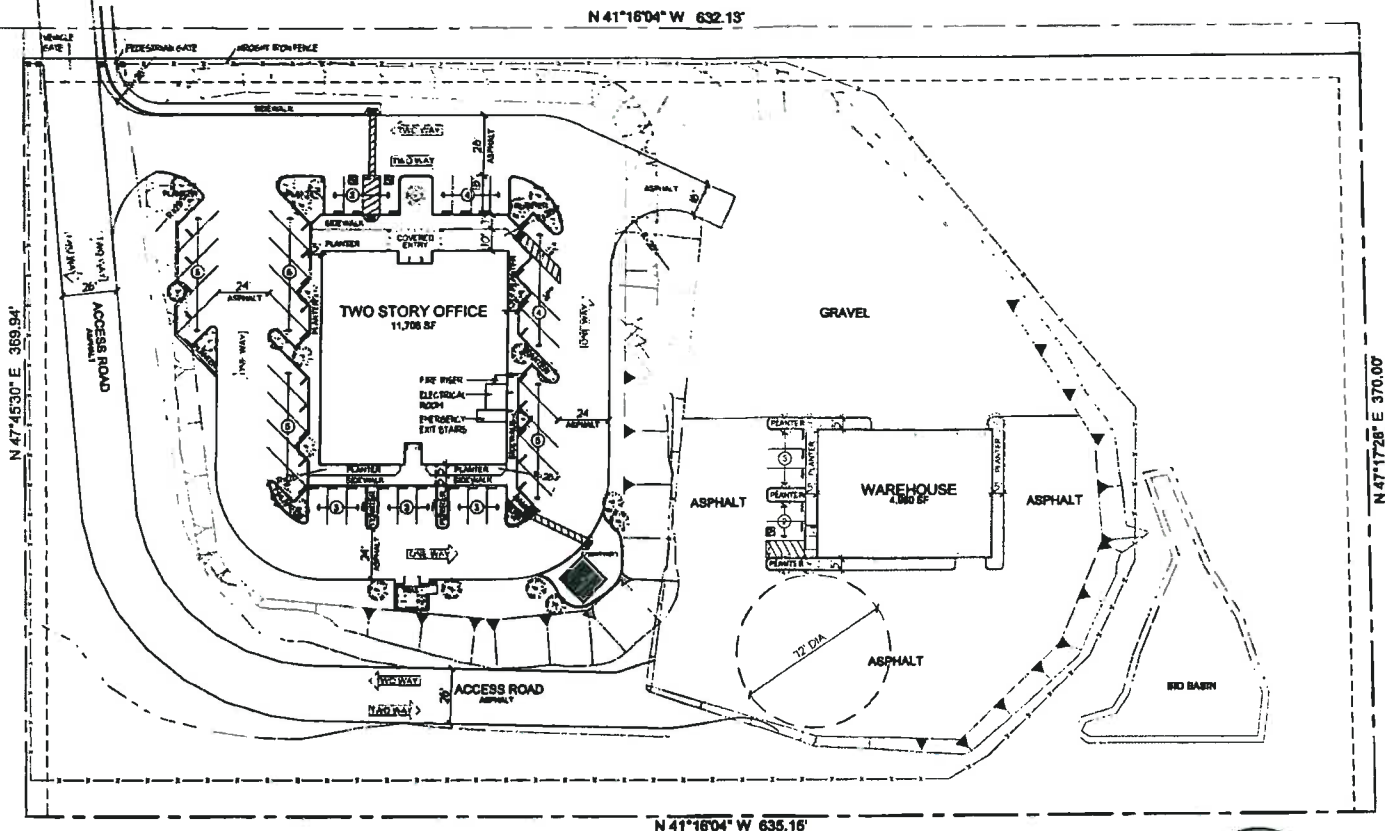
PROPOSED PROJECT SITE PLAN
